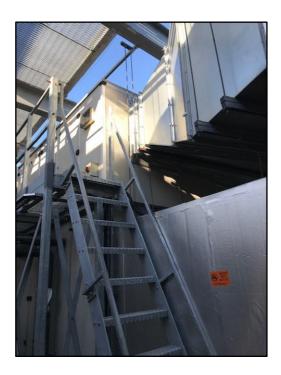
Stairs leading part way up from roof lower (plant) level to roof top level, which can be used to carry PV panels (and rails, if using) part way up to roof top level
